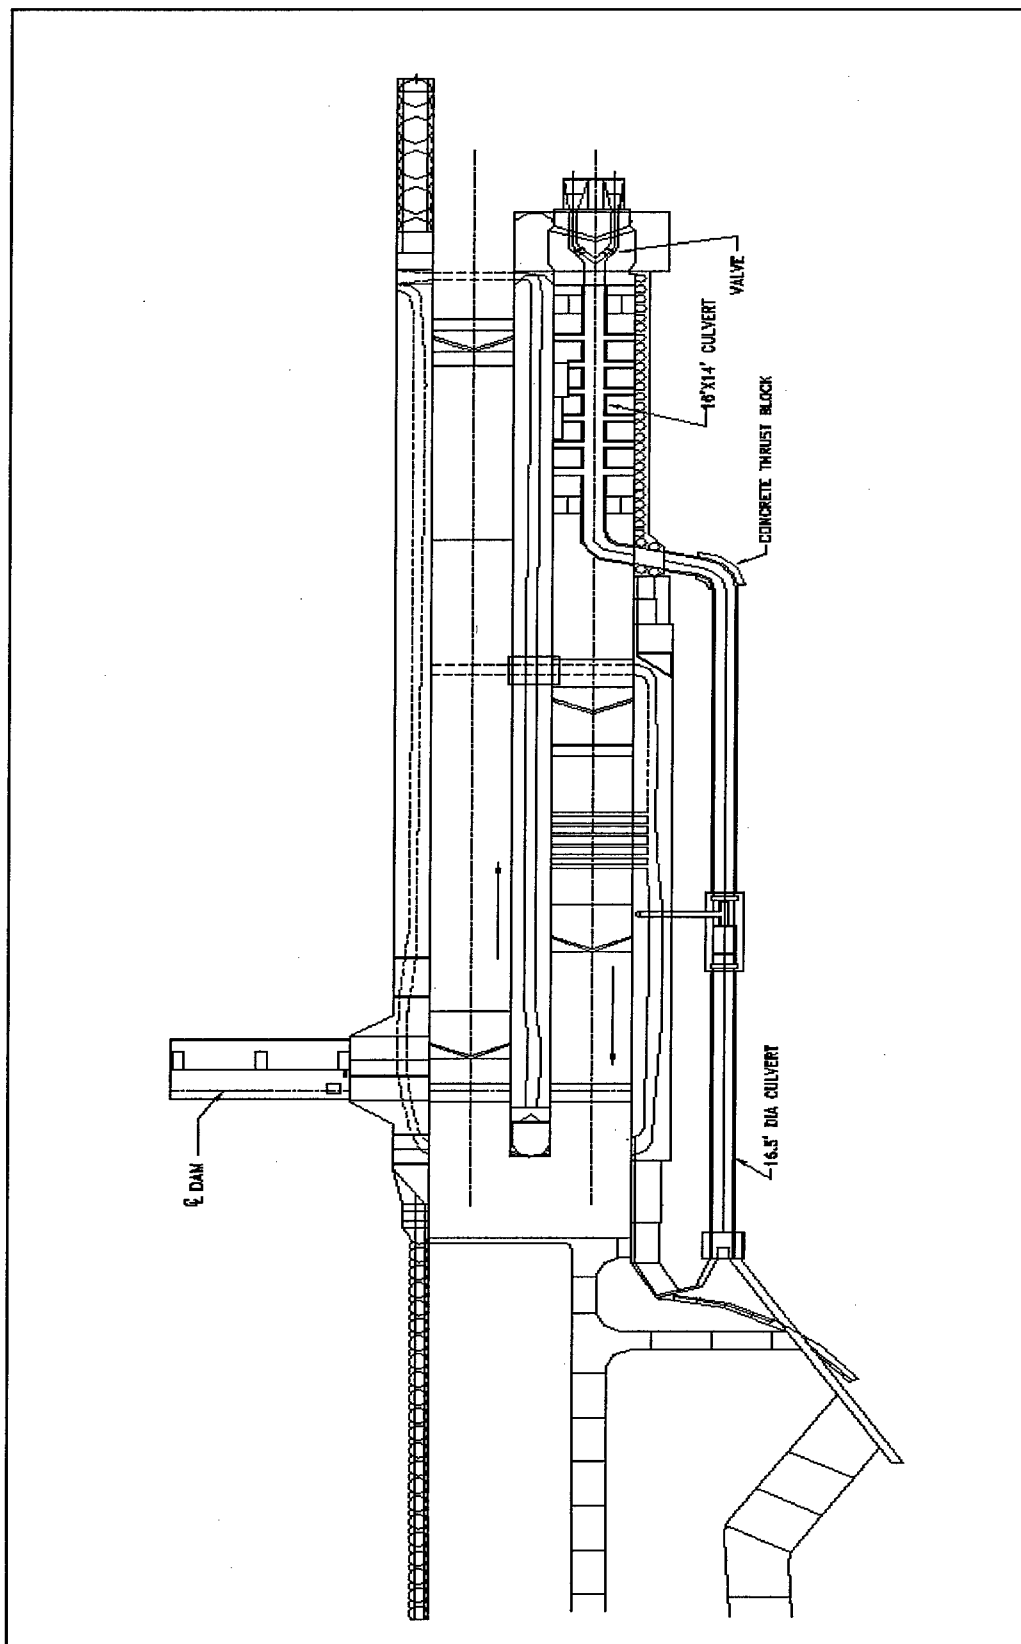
Plan 7, plan view of lock extension filled by external culvert
